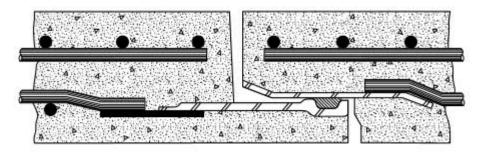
Steel End Ring Joint with Spigot Groove and O-Ring gasket
